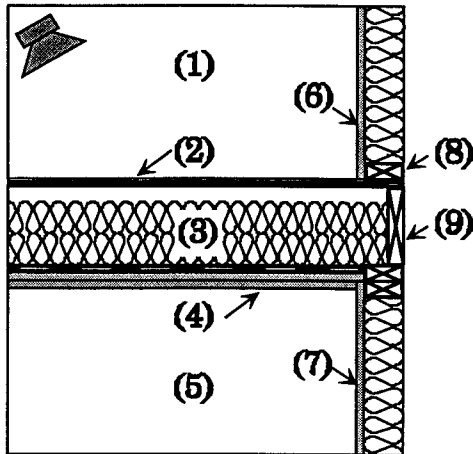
Section through the floor and load-bearing party walls. (1): source room, (2): 15.9 mm OSB decking, (3): 235 mm deep cavity with two layers of 89 mm batt insulation, (4): 2 layers 12.7 mm type X gypsum board mounted on resilient channels, (5): receive room, (6) and (7): 15.9 mm type X gypsum board, (8): 38x89 mm sole plate, (9): 38x235 mm joist header.
